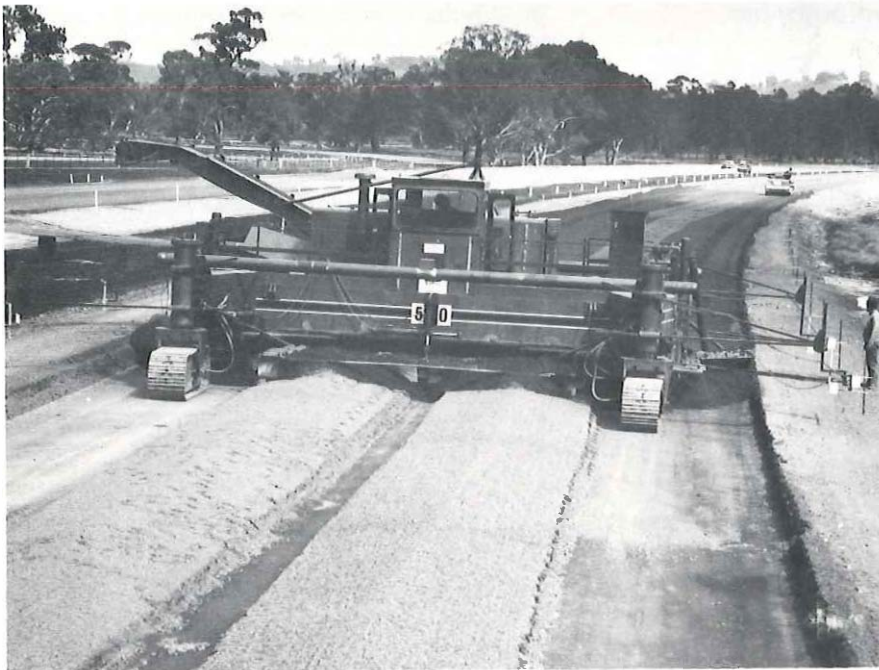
The Autograde TS 500 machine on the Hume Freeway.
